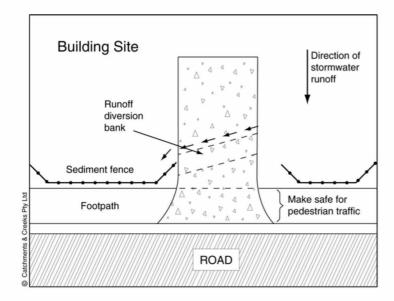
Typical stabilised all-weather site access – PLAN VIEW
